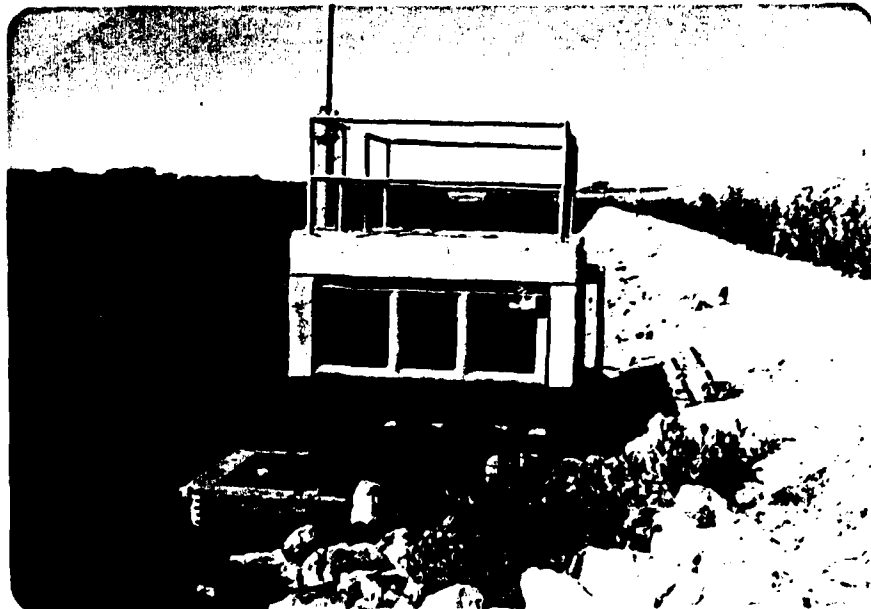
View of intake tower structure and surrounding riprap during normal pool conditions. Note crushed rock service road along the top of the riprap.
